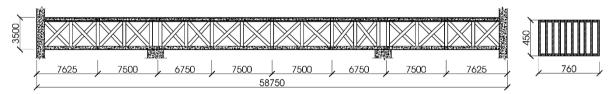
The solution truss with multi layer bar: a) Diagram of truss; b) Cross section of typical bars.
